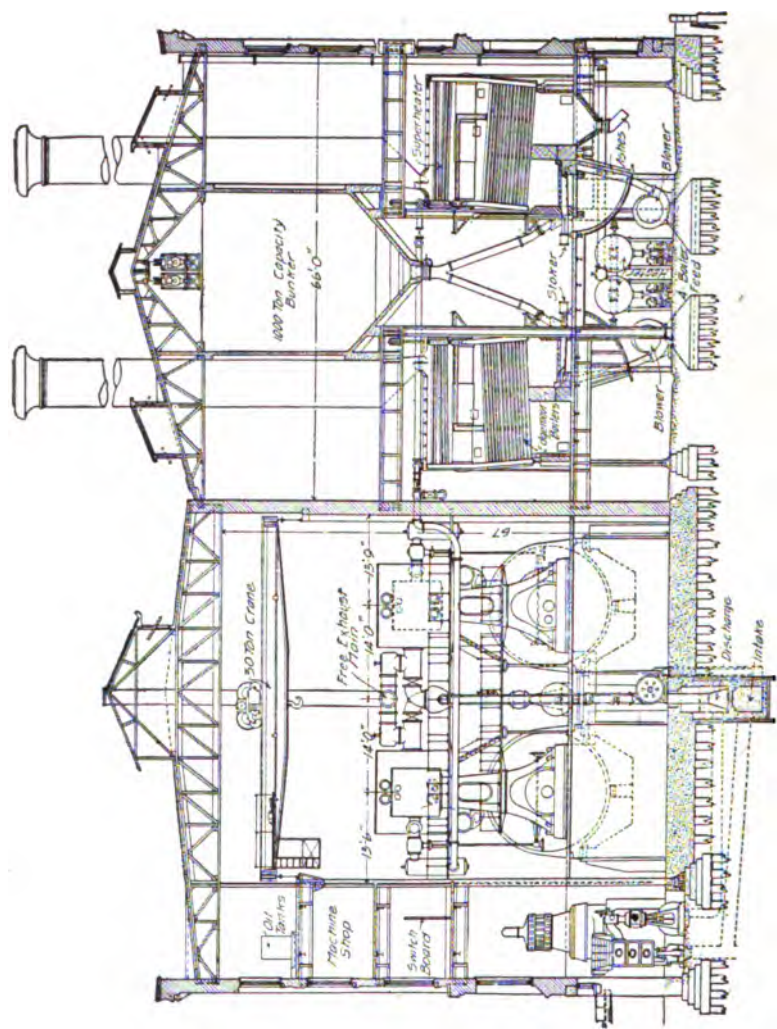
Boiler Feed Piping, Yonkers Plant, New York (*Power*).
